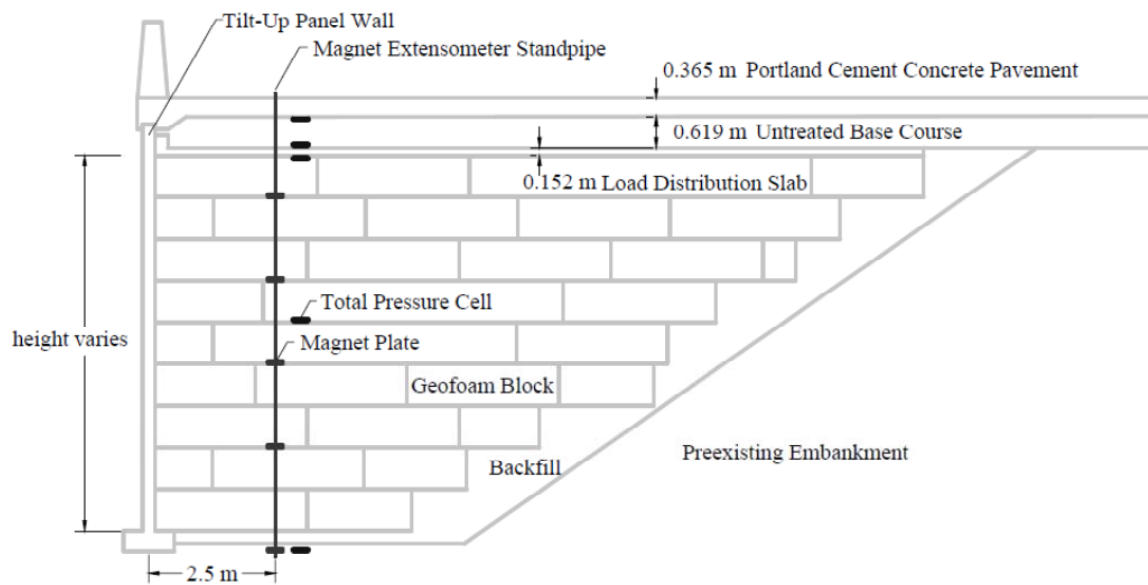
Typical Instrumentation Layout Used at the 3300 South Street Array (Newman et al. 2010).
